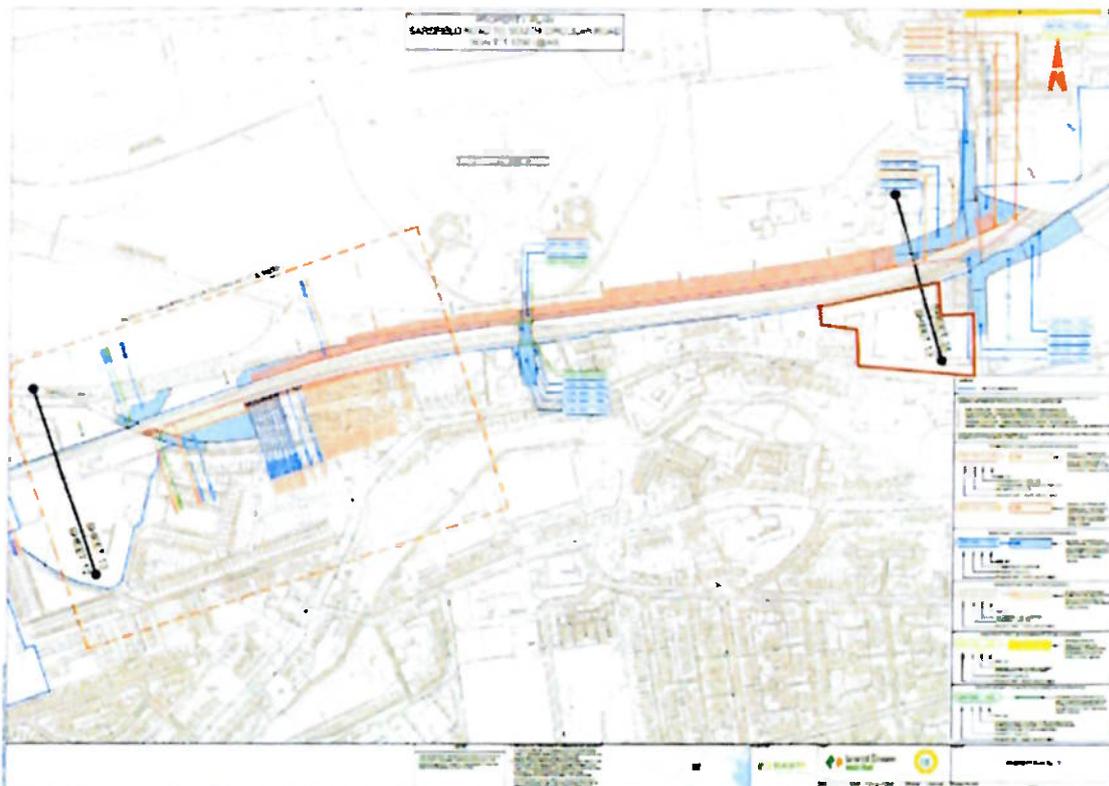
Property Plan for the section of the railway adjacent to the subject property (Property Plan No. 13)
